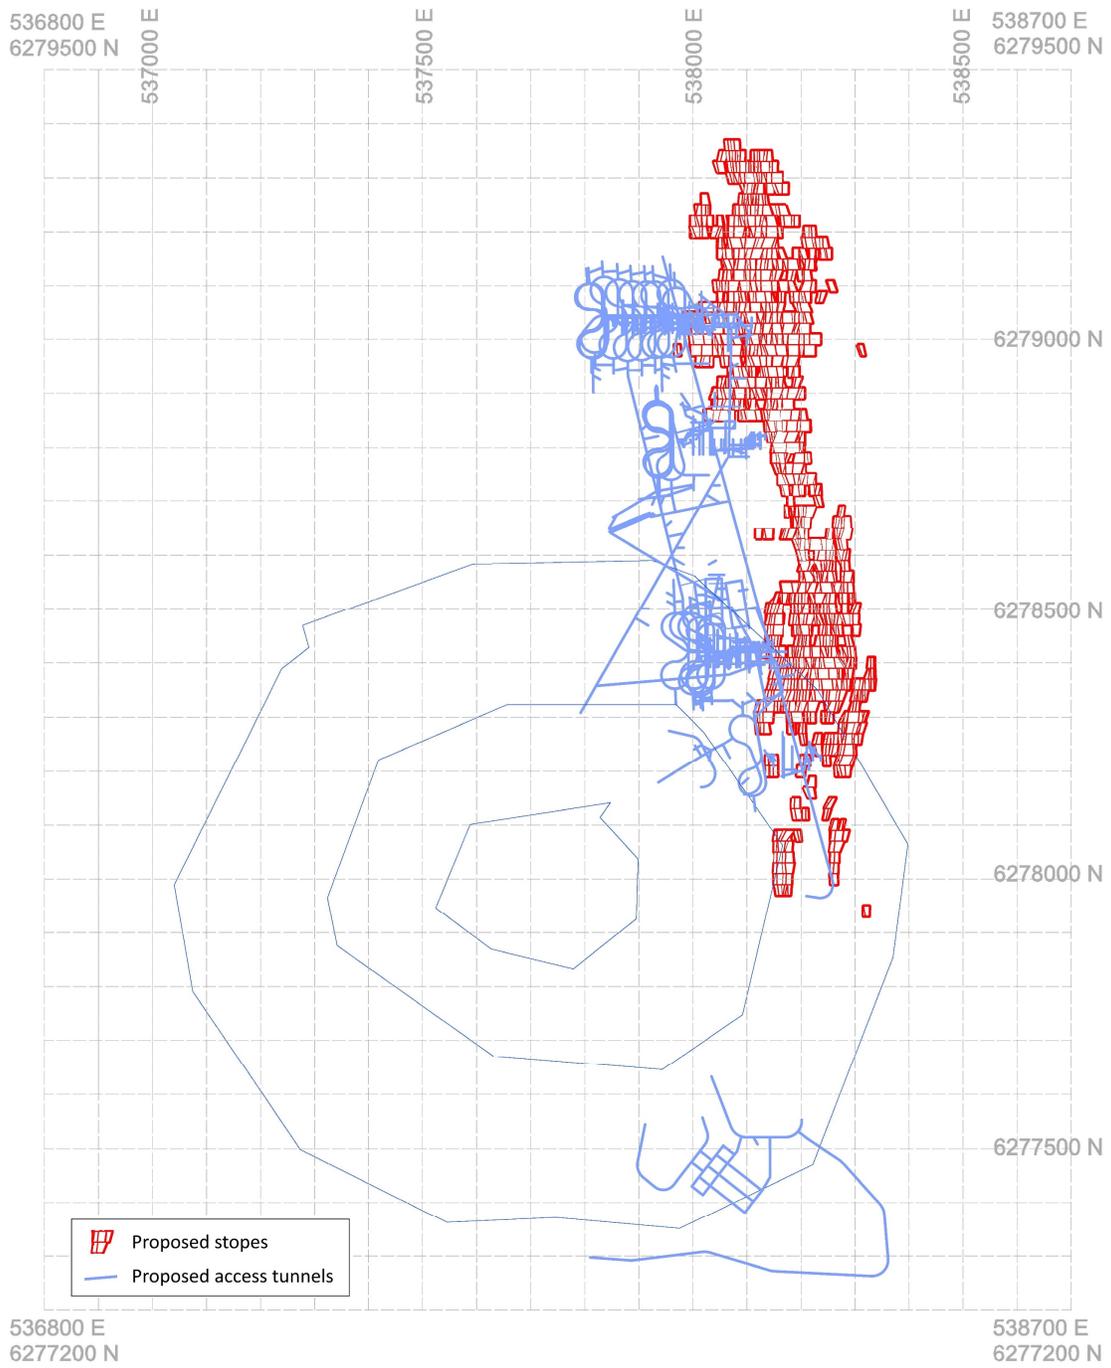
Stopes and access tunnels - plan view (m MGA Zone 55)
